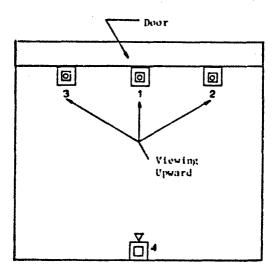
Shelter "A" Camera Locations, Top View (Internal)
